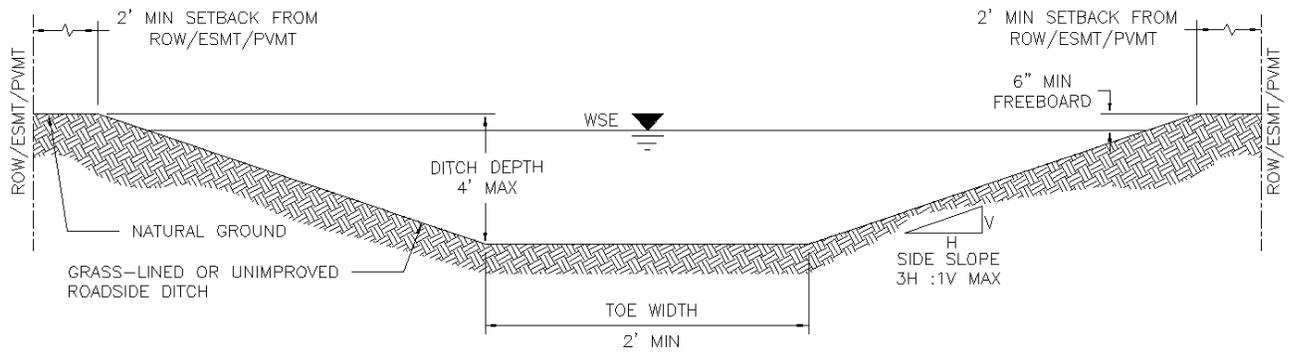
GRASS-LINED/UNIMPROVED ROADSIDE DITCH CROSS SECTION
